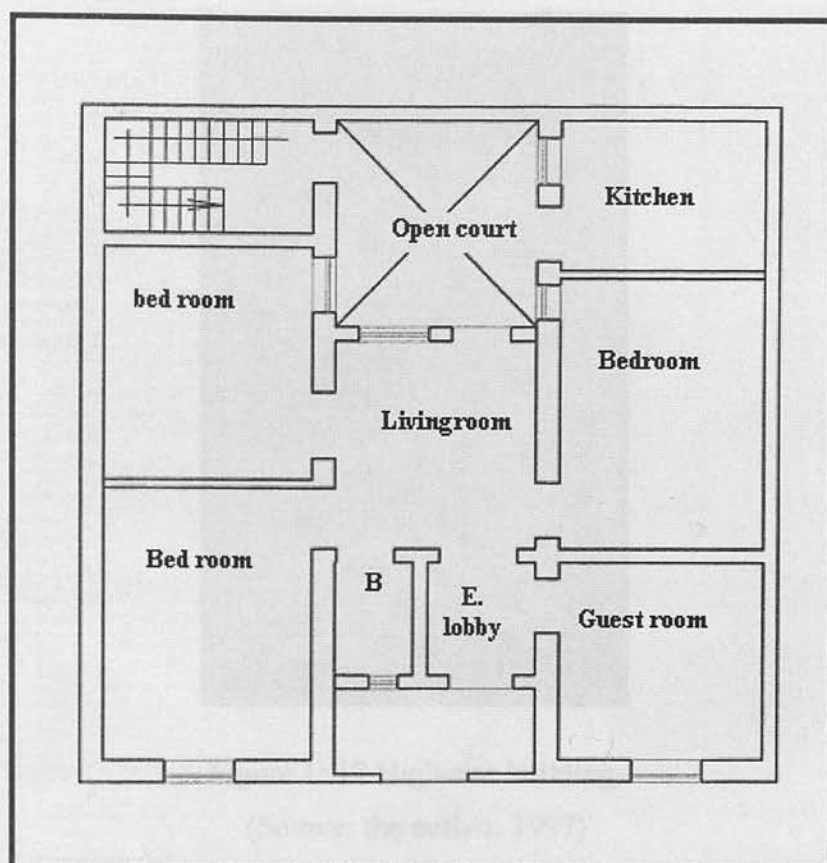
13 Typical middle-class family house pattern, 1965-1975
